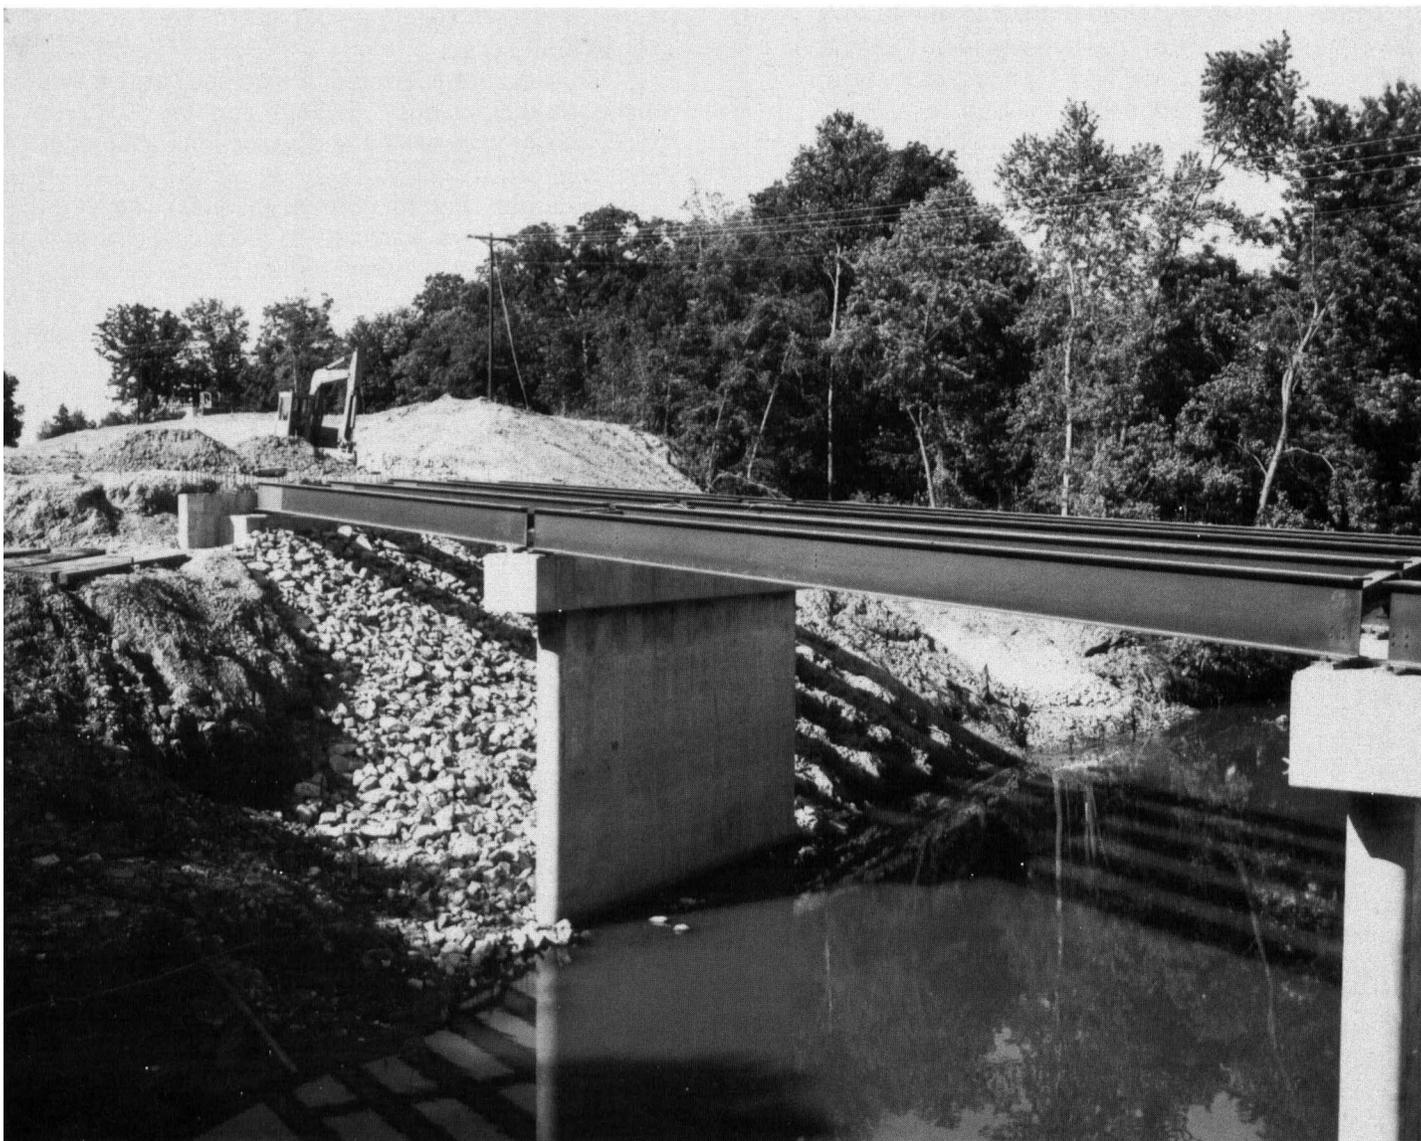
An area of Orthents, silty, undulating, that has been extensively altered by bridge and road construction.
